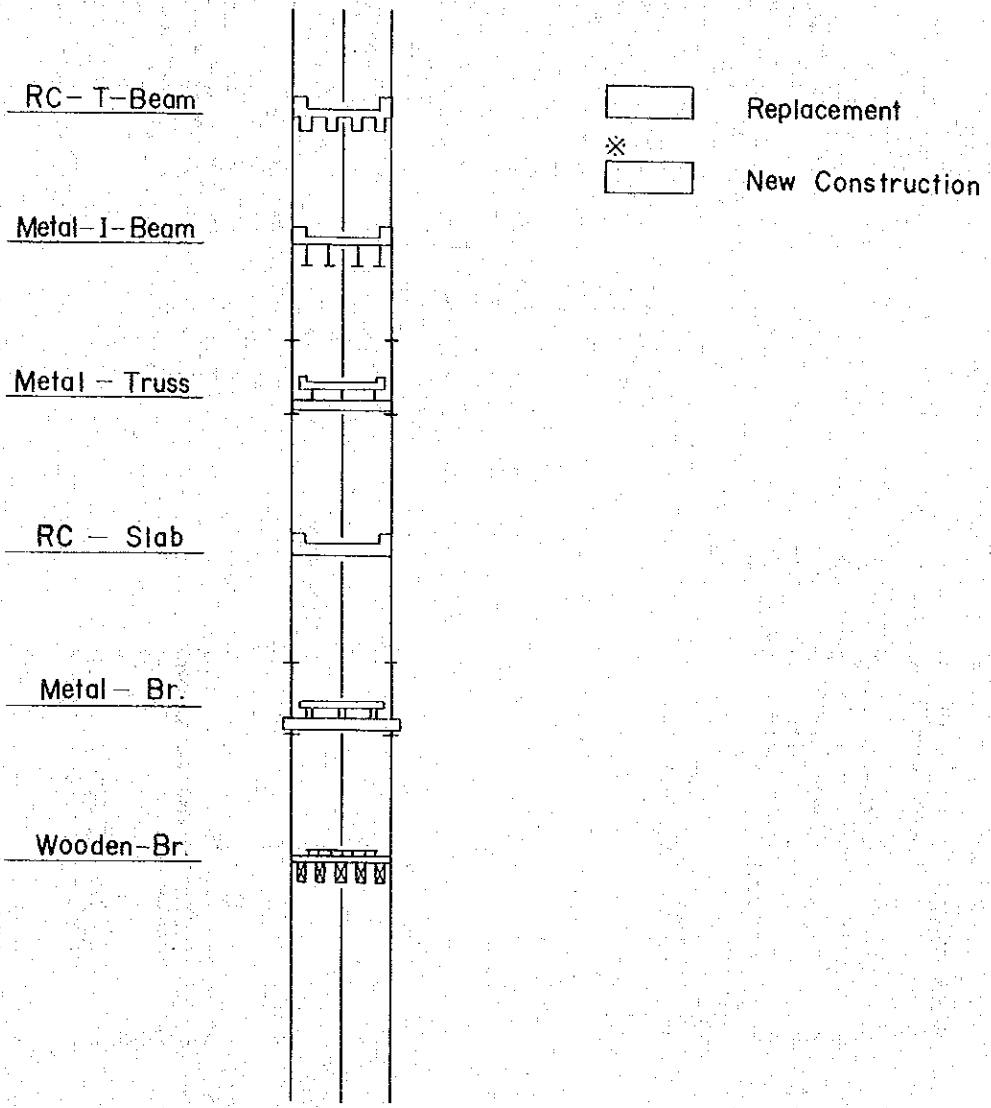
ROAD & BRIDGE IMPROVEMENT
